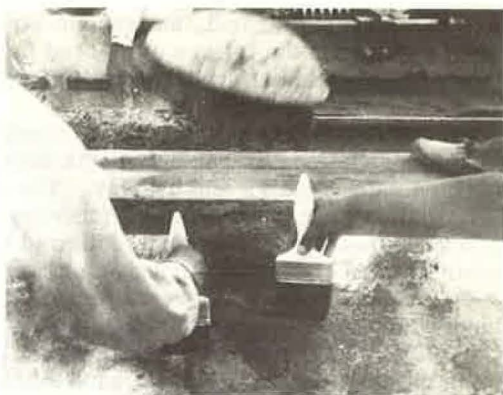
Application of epoxy resin formulation to treated surface of existing concrete slabs immediately before placing overlay concrete on National Highway 2.
